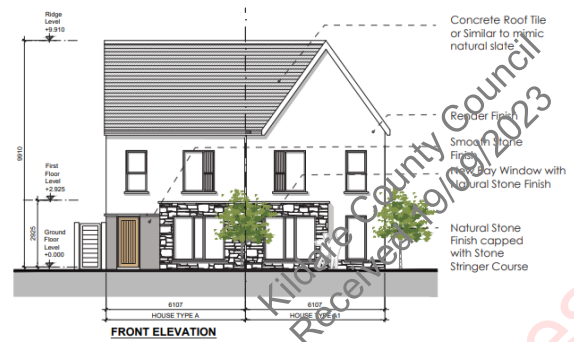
REVISED A-A1 TYPE ELEVATIONS FACING STREETSCAPES
